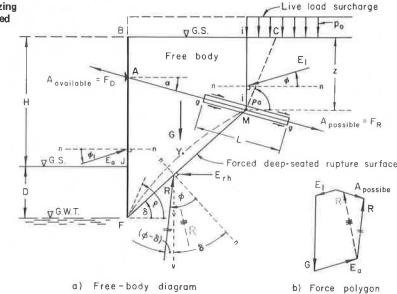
Tie-back system for analyzing internal stability of free-end supported sheet piling wall.
